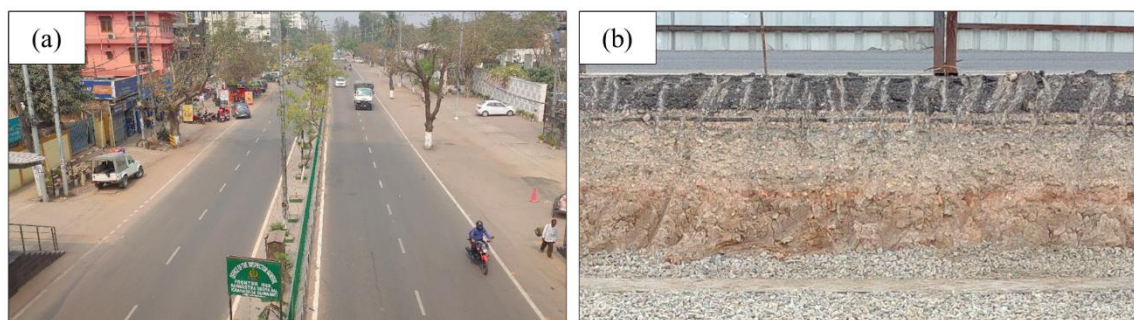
A typical flexible pavement: (a). general view, and (b). sectional view.
